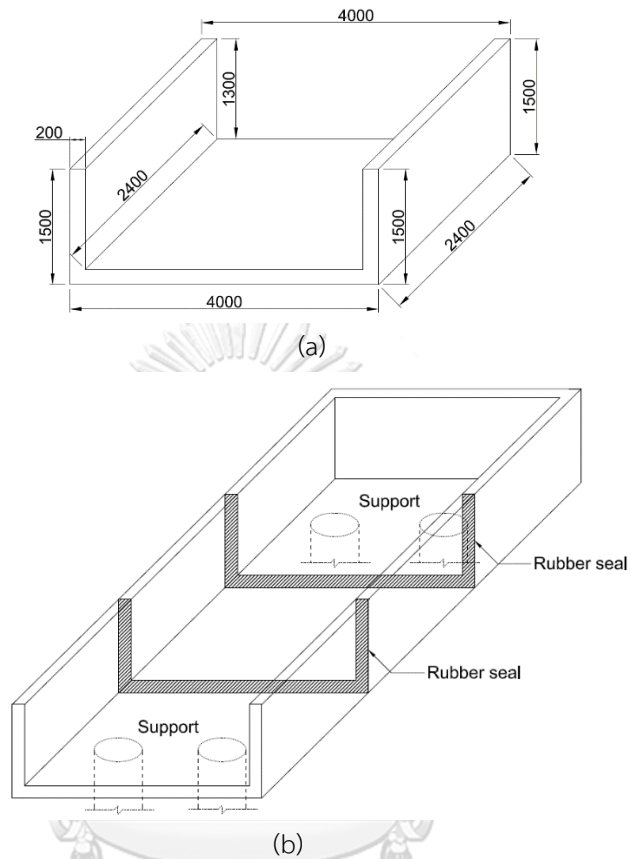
Prototype of a precast swimming pool; (a) Dimensions in mm of the precast concrete segment; (b) The connections of precast segments and rubber seals
